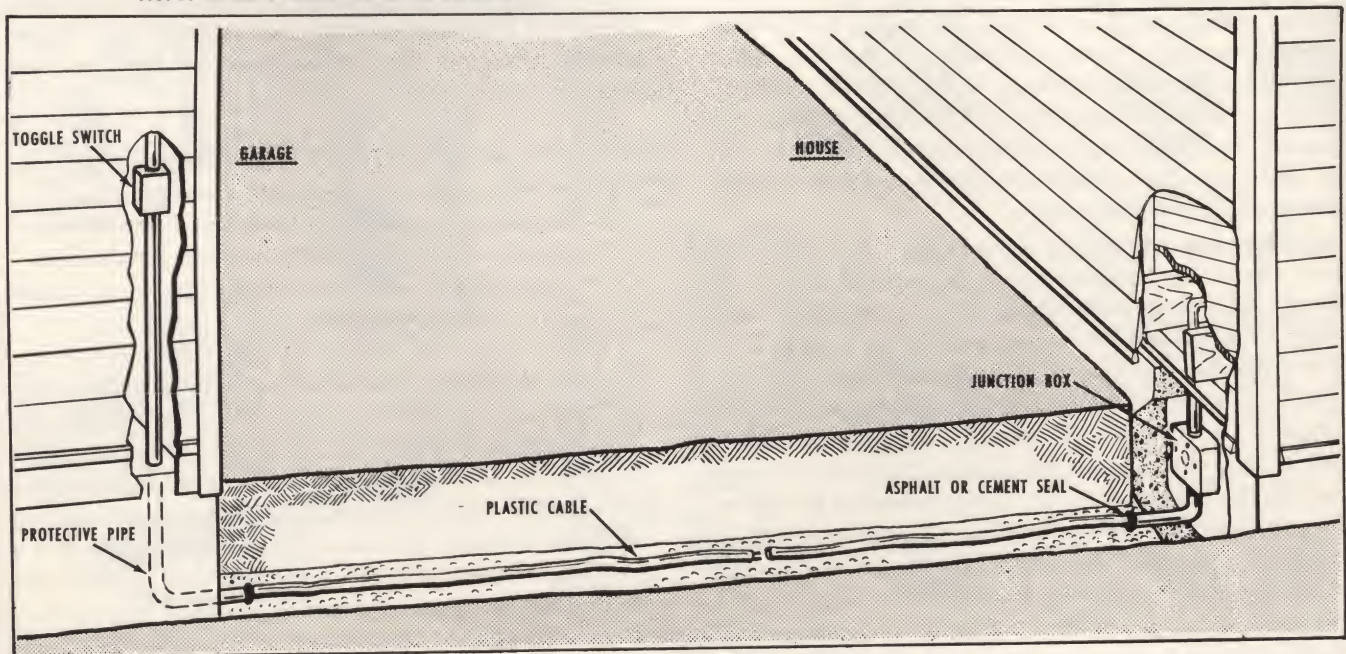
UNDERGROUND WIRING BETWEEN HOUSE AND GARAGE OR OUTBUILDING
